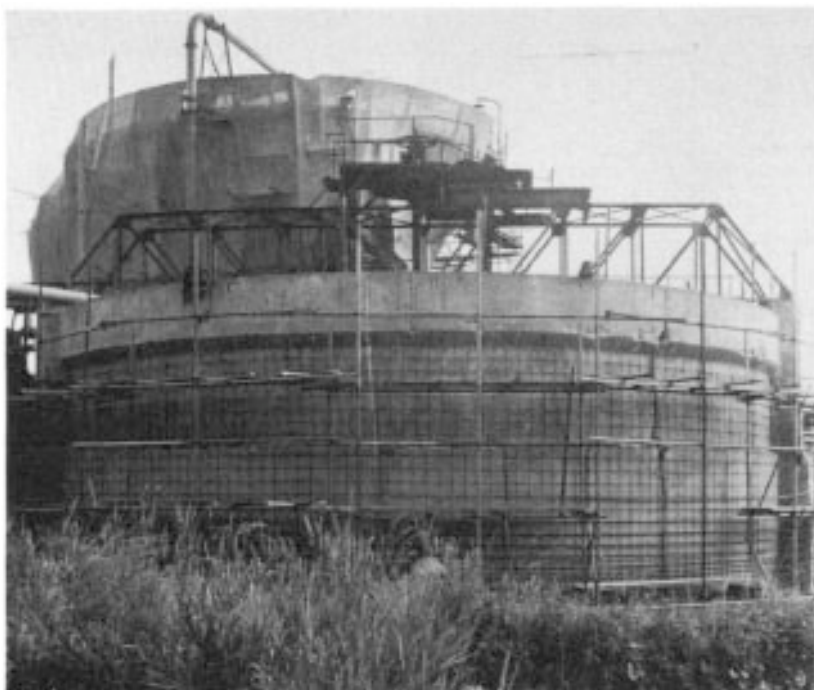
Repair of concrete slurry tank with reinforced gunite. Courtesy, Cement Gun Co. UK Ltd.
